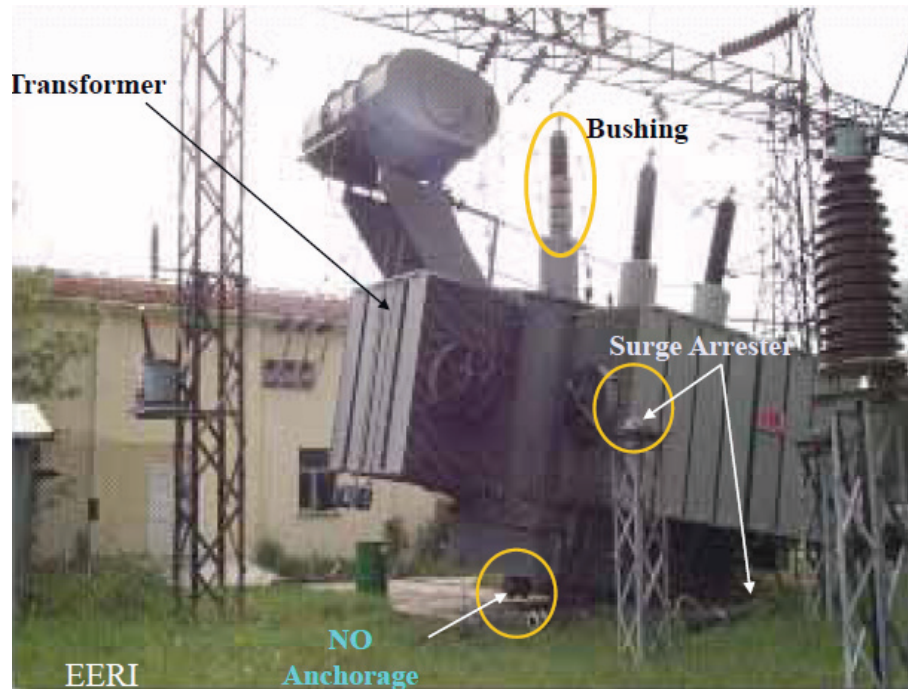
Damage to Transformer Foundation due to Lack of Anchorage, Izmit Turkey 1999 (Wang, 2008)
